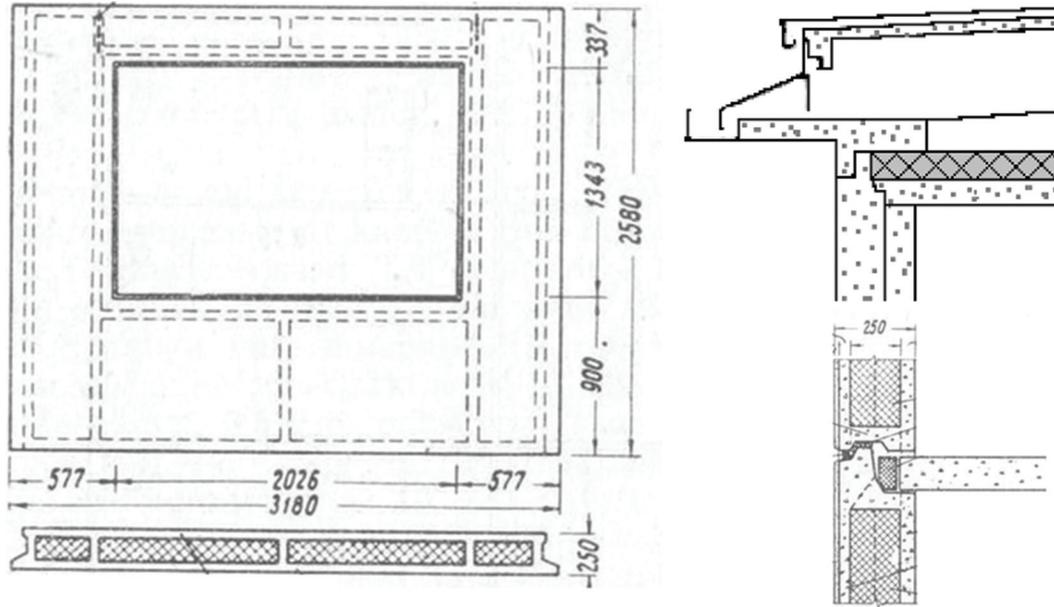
Original design drawing of a large panel prefabricated concrete element (left). External wall/roof junction (right top) and external wall/inserted ceiling (right bottom).
